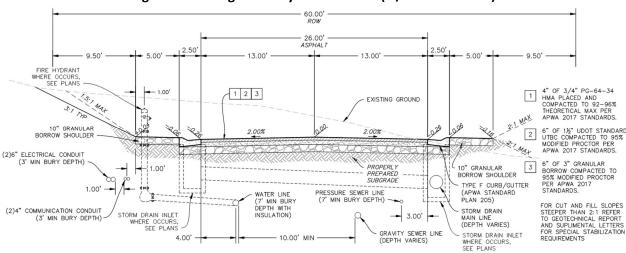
60' Right of Way Road Section (w/ Curb & Gutter)
